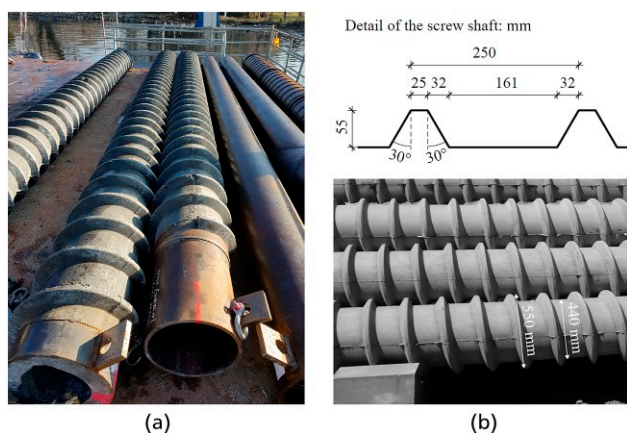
Prefabricated concrete screw-type piles (PCSP) for the test foundation of the cable car project across Lake Zurich. (a) Prefabricated concrete screw-type piles (Arnold and Askarinejad, 2020); (b) general information on PCSP geometry
